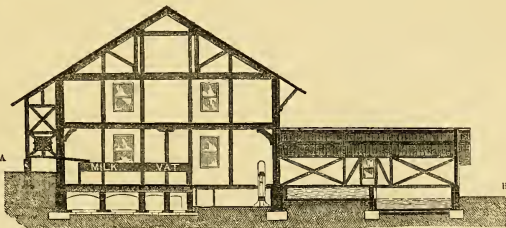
TRANSVERSE SECTION, FROM POINTS A TO B IN GROUND PLAN.
